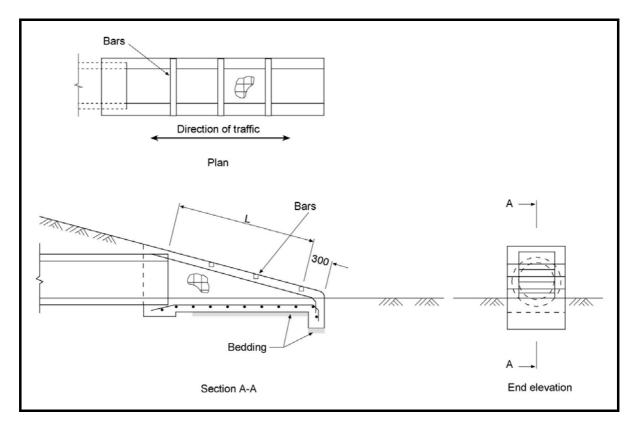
Driveable Culvert End Wall for a Small Pipe
